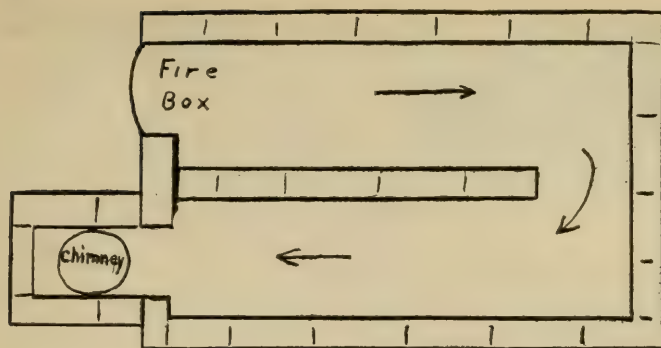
PLAN OF FOSTER'S WAX-RENDERING FURNACE.
